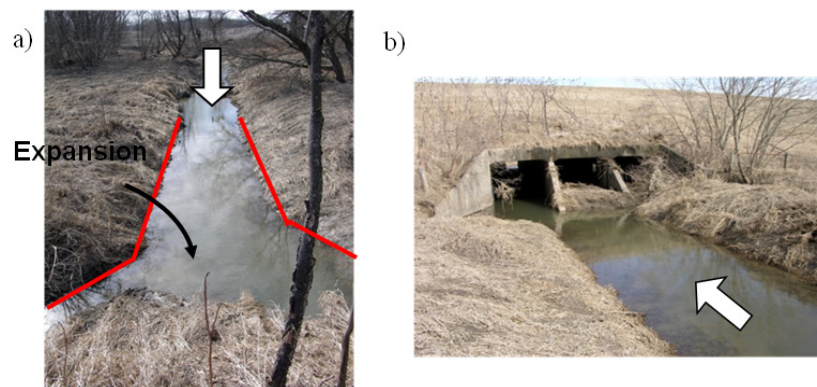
Silted culvert at a three-box culvert in Iowa (USA): arrow represents the flow direction: a) view of the upstream area from the culvert, and b) view of the silted culvert entrance
